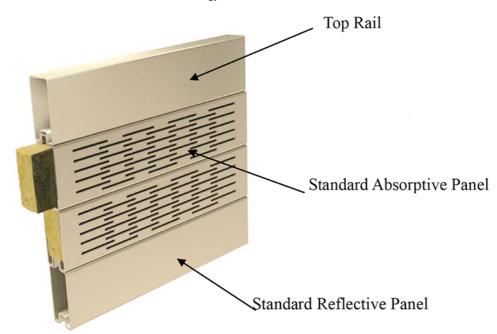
Typical Sound Wall Section with Top Rail and Panels
